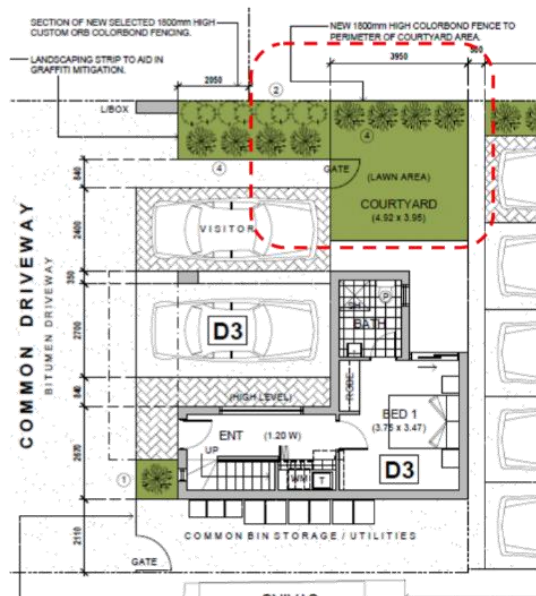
Dwelling 3 Private Open Space Adjoining 1/80 Dorothy Street
